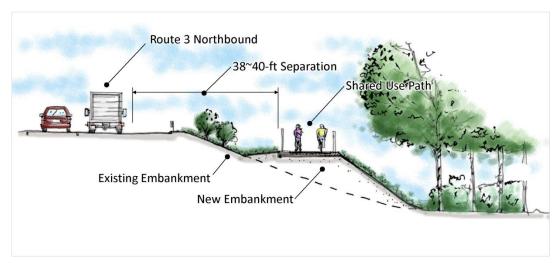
A. Glastonbury Alternative 6 - Path on New Embankment
